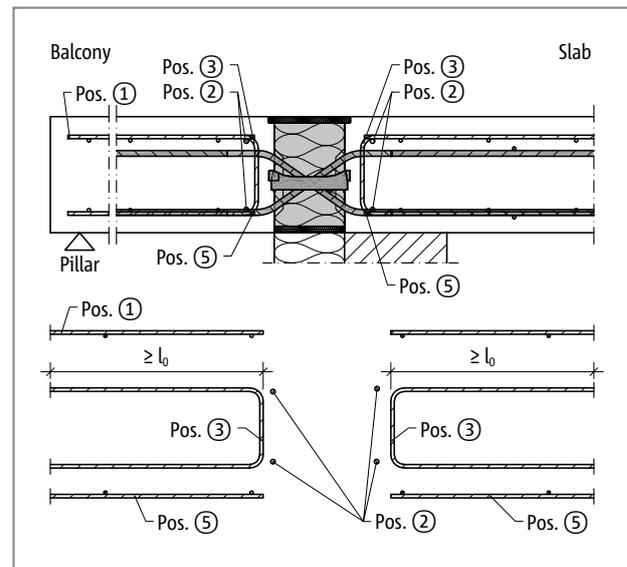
Schöck Isokorb® XT type Q-VV5 to Q-VV8: On-site reinforcement
